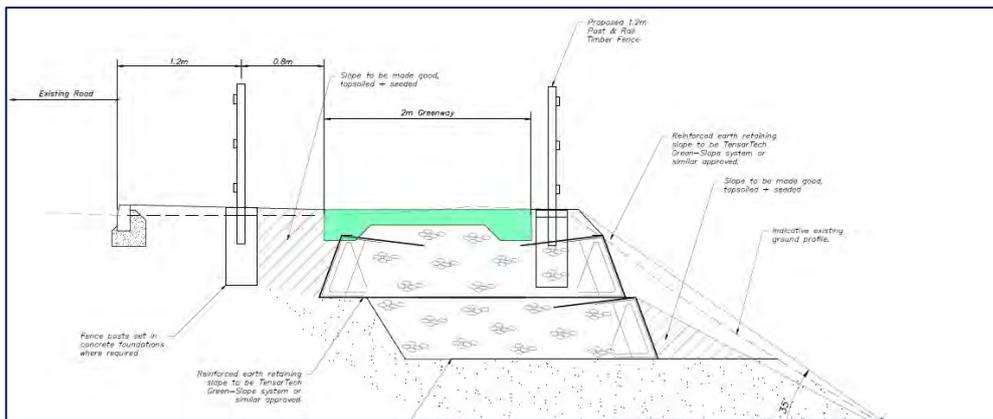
Proposed Reinforced Earth Retaining Slope
